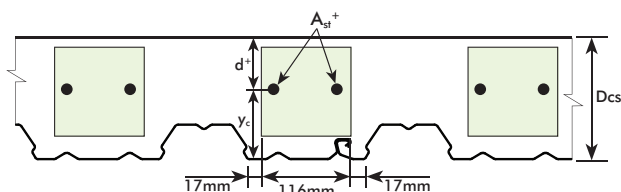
B Allowable Positions of Steel Reinforcement in the Composite Slab With KF40®
